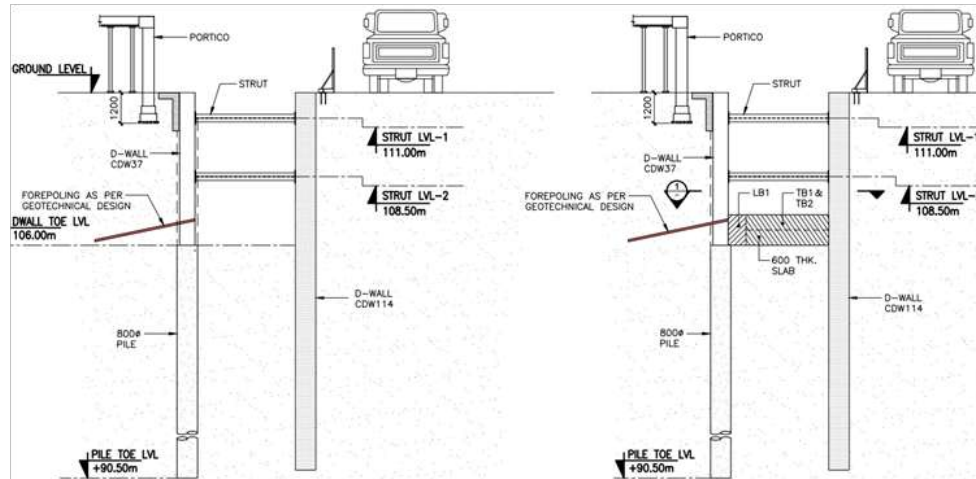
Cross Section showing excavation done till the soffit of top slab of box tunnel (left side) and casting of beams along with top slab of box tunnel (right side).
